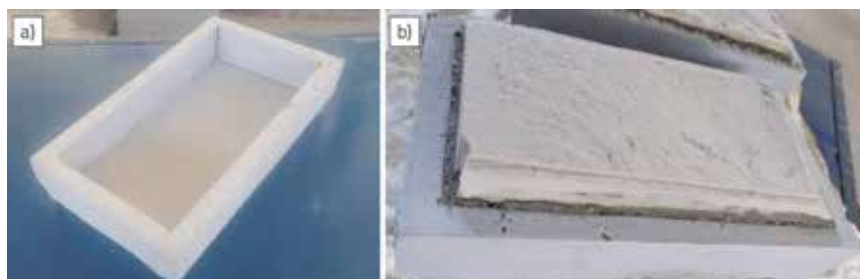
a) Steel mould; b) Half-specimen placed in the mould
